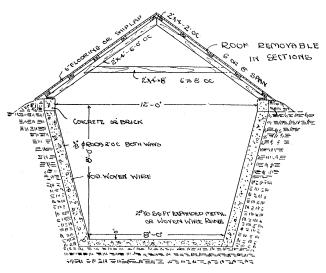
Cross-section of trench silo with permanent walls and roof.
